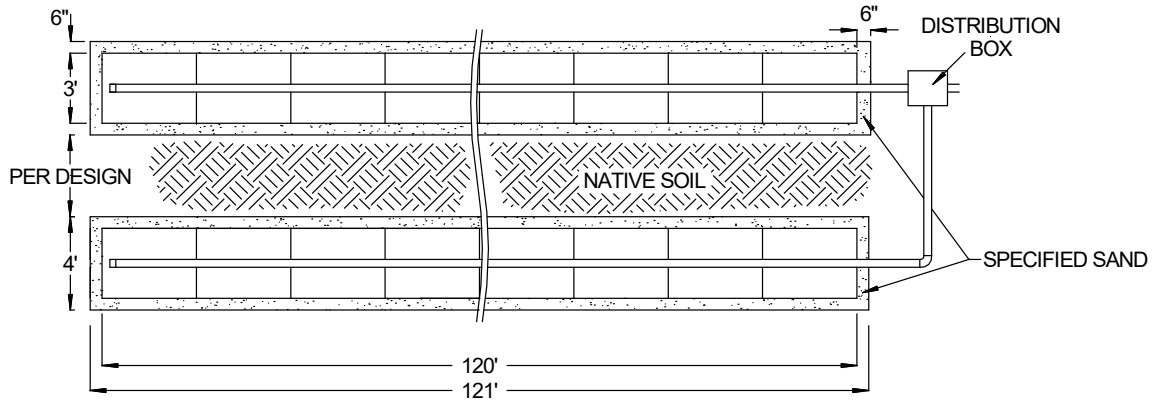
SECTION VIEW – B43 TRENCH SYSTEM – LEVEL SITE
